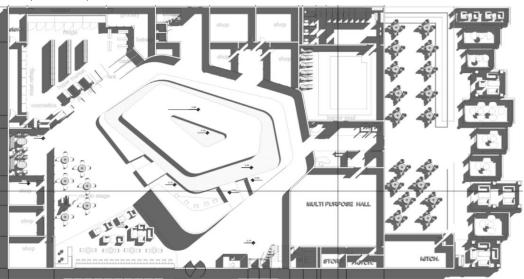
SHOWS THE GROUND FLOOR PLAN
